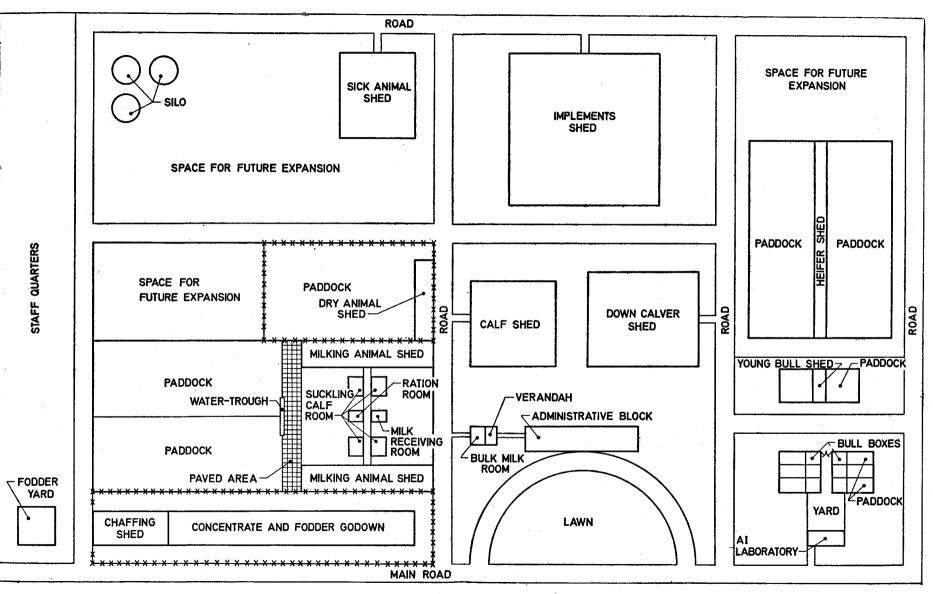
A LAYOUT PLAN FOR LARGE DAIRY FARMS
